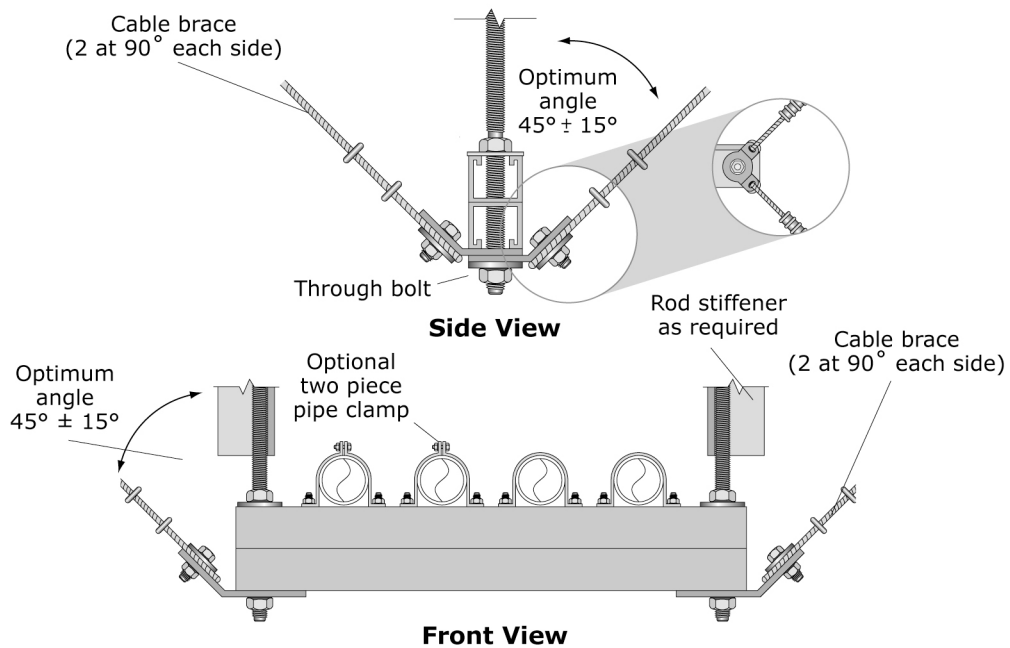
Cable bracing - Trapeze supported piping (ER).
